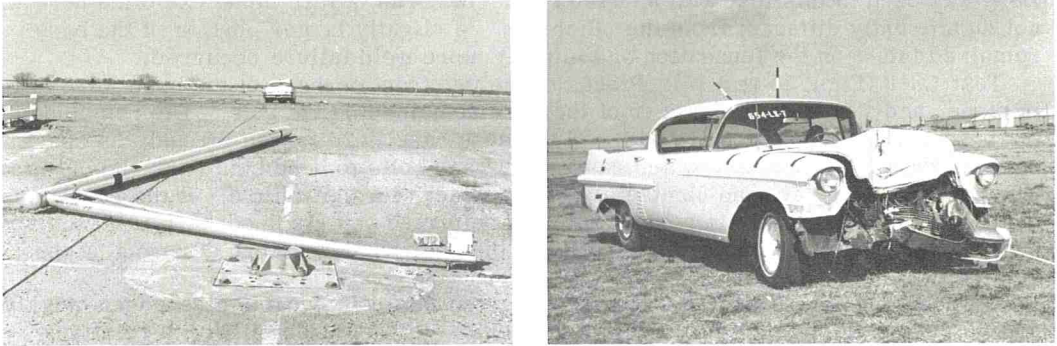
Final position of and damage to luminaire support, Test LS-7.
